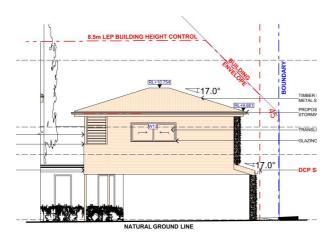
Drawing No. DA13 by Action Plans depicting the western elevation - Carport/Home Office.
